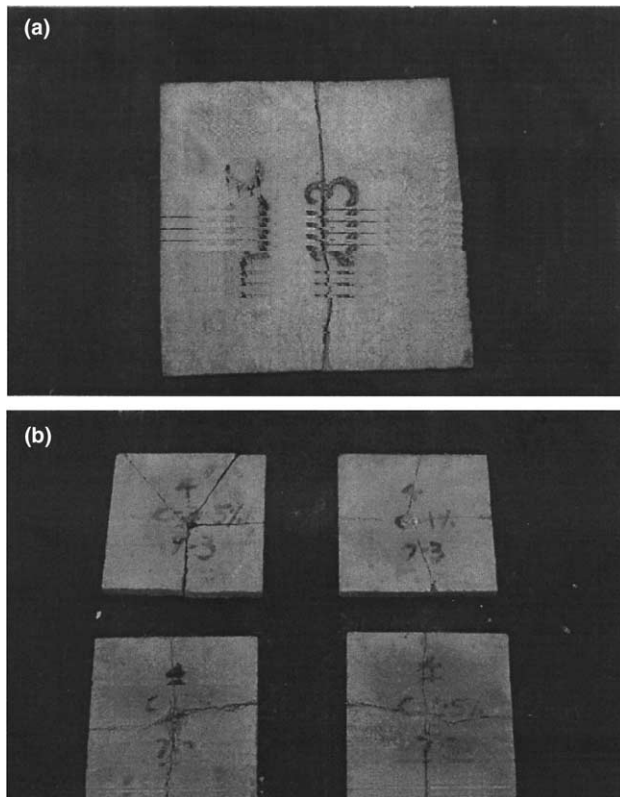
(a) Typical crack pattern of plain Mortar slab Specimen (assembled after impact). (b) Typical crack pattern of coir Reinforced slabs (assembled).
